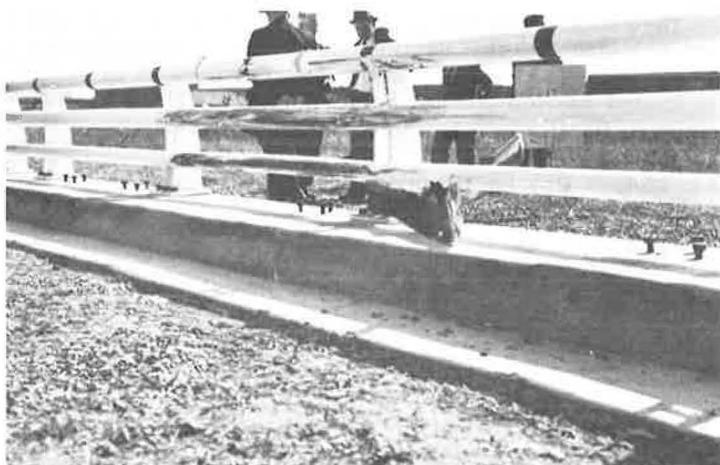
High-strength bridge rail which inflicted severe damage while redirecting impacting vehicle.
